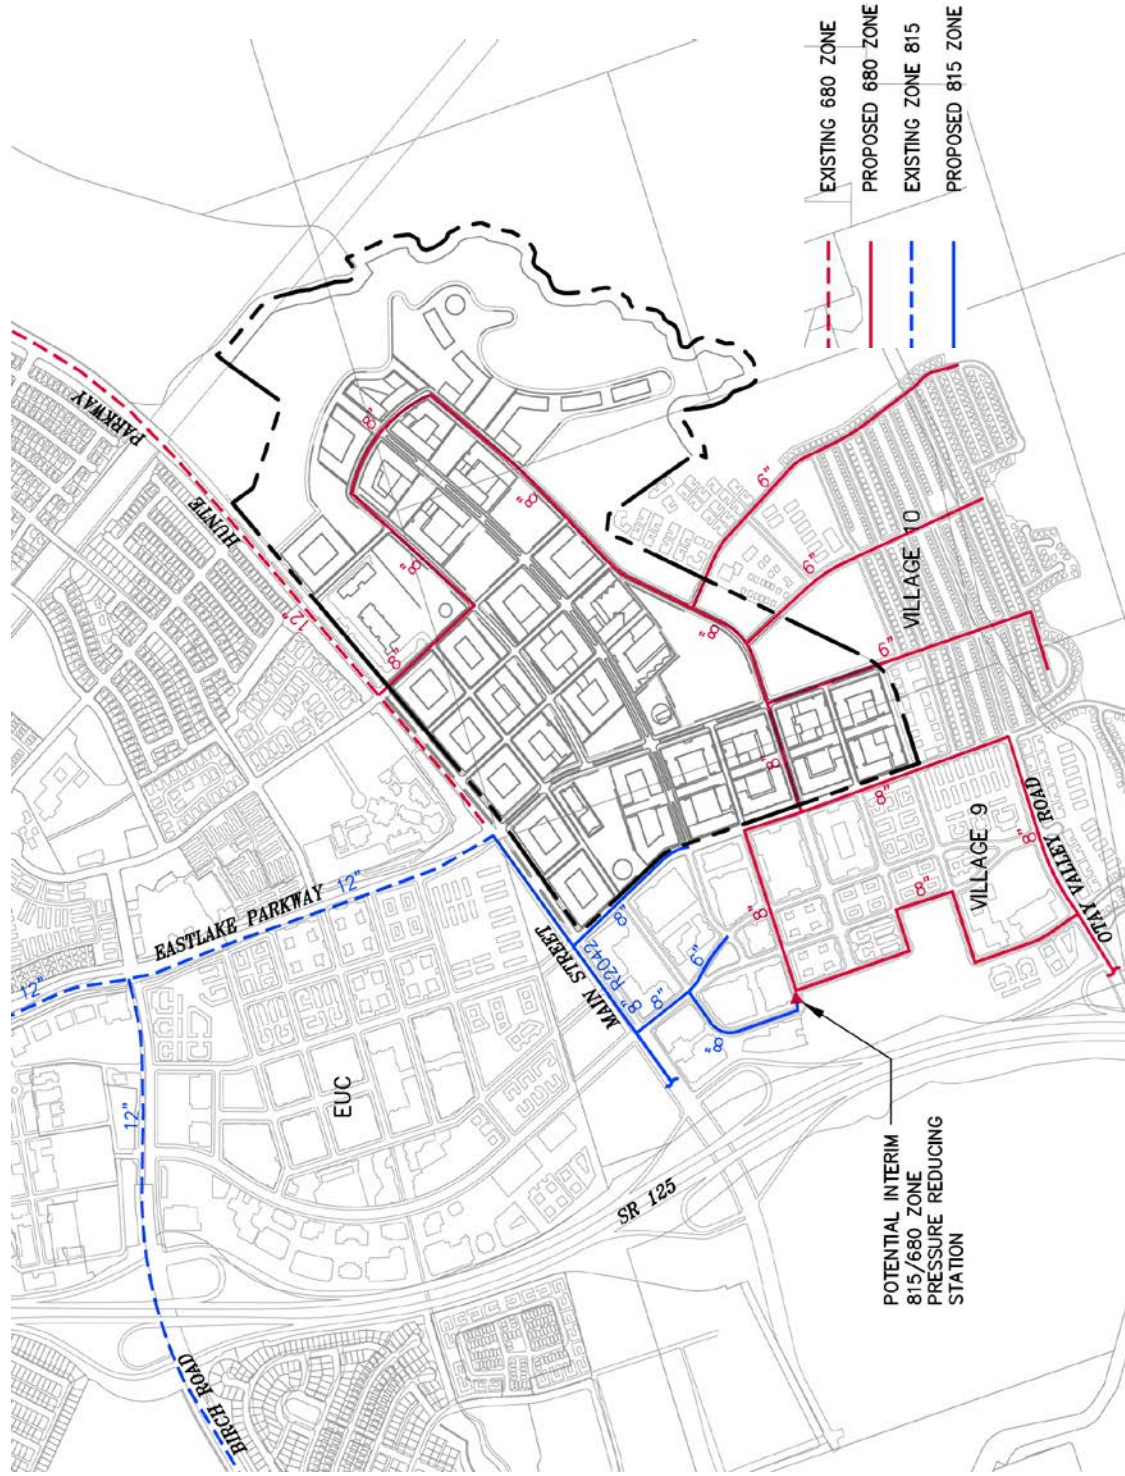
ON-SITE RECYCLED WATER FACILITIES
